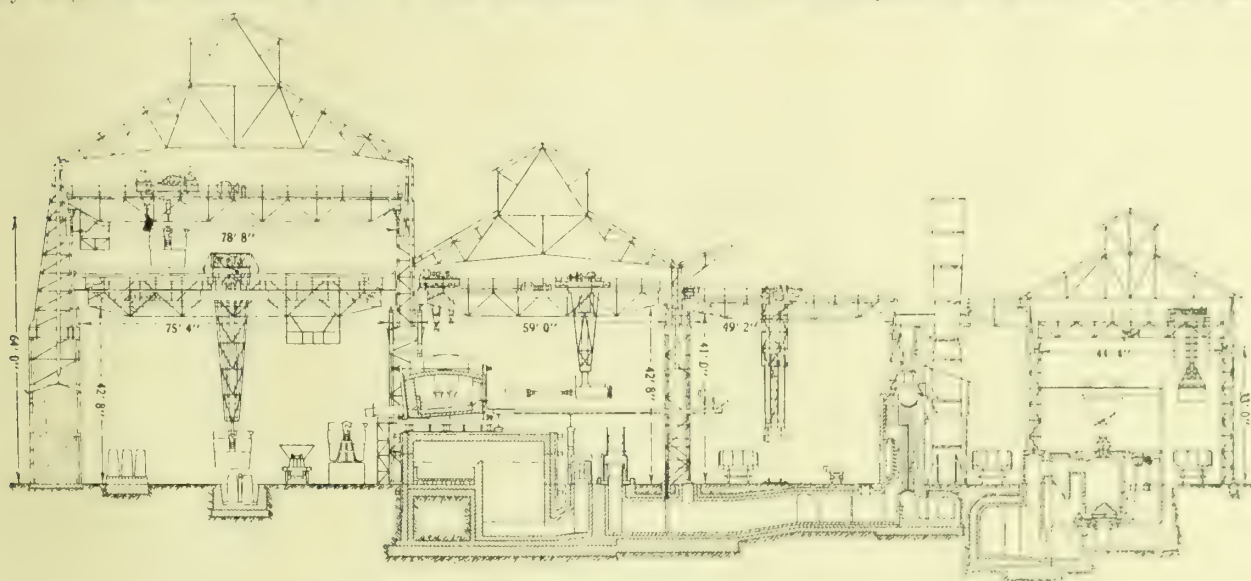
CROSS SECTION OF OPEN-HEARTH PLANT EQUIPPED WITH WASTE HEAT BOILERS.
